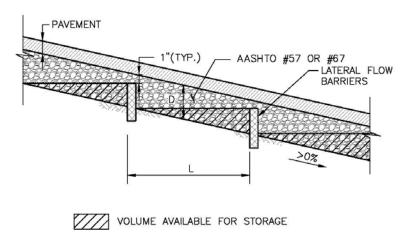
Permeable Pavement Profile, Sloped Installation.
